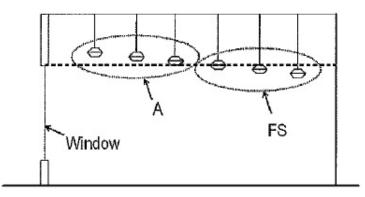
Figure A: Elevation view showing a nonresidential application of indoor lighting, labeled FS, which will be subject to this article and indoor lighting, labeled A, which is installed so that it is not subject to this article.
